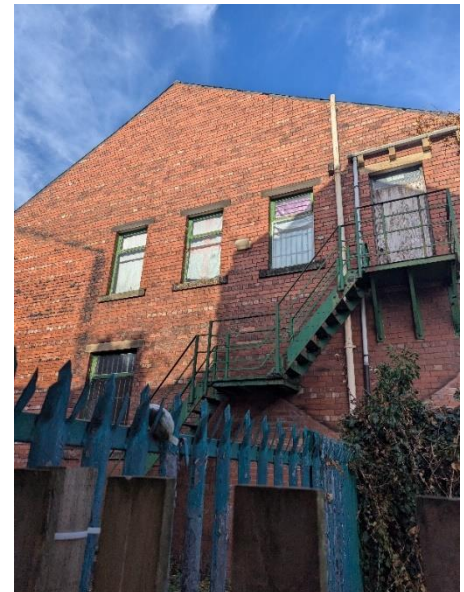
Southern elevation of 9 Oates Street, looking into the courtyard
